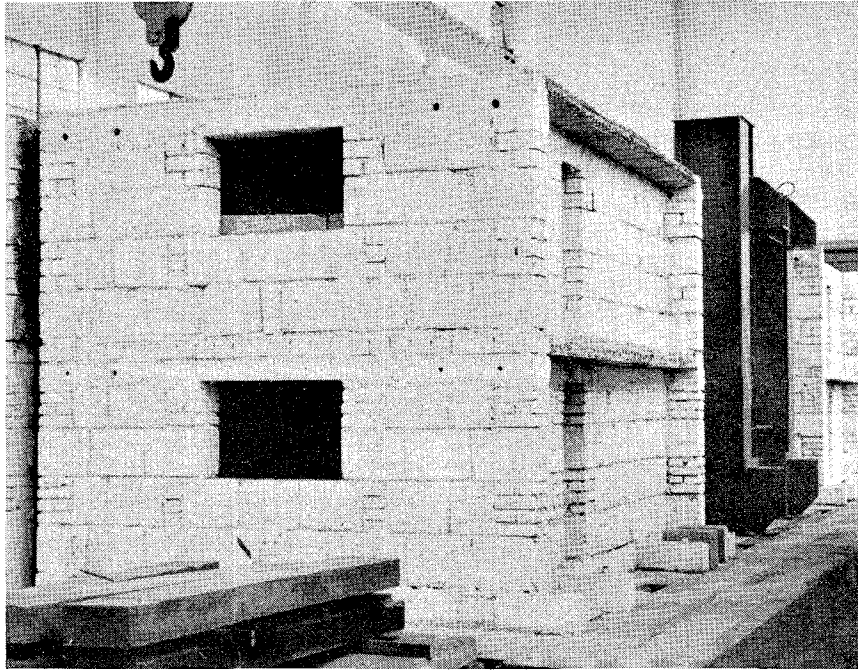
Half-scale unreinforced models ready for testing at Tongji University, Shanghai.
